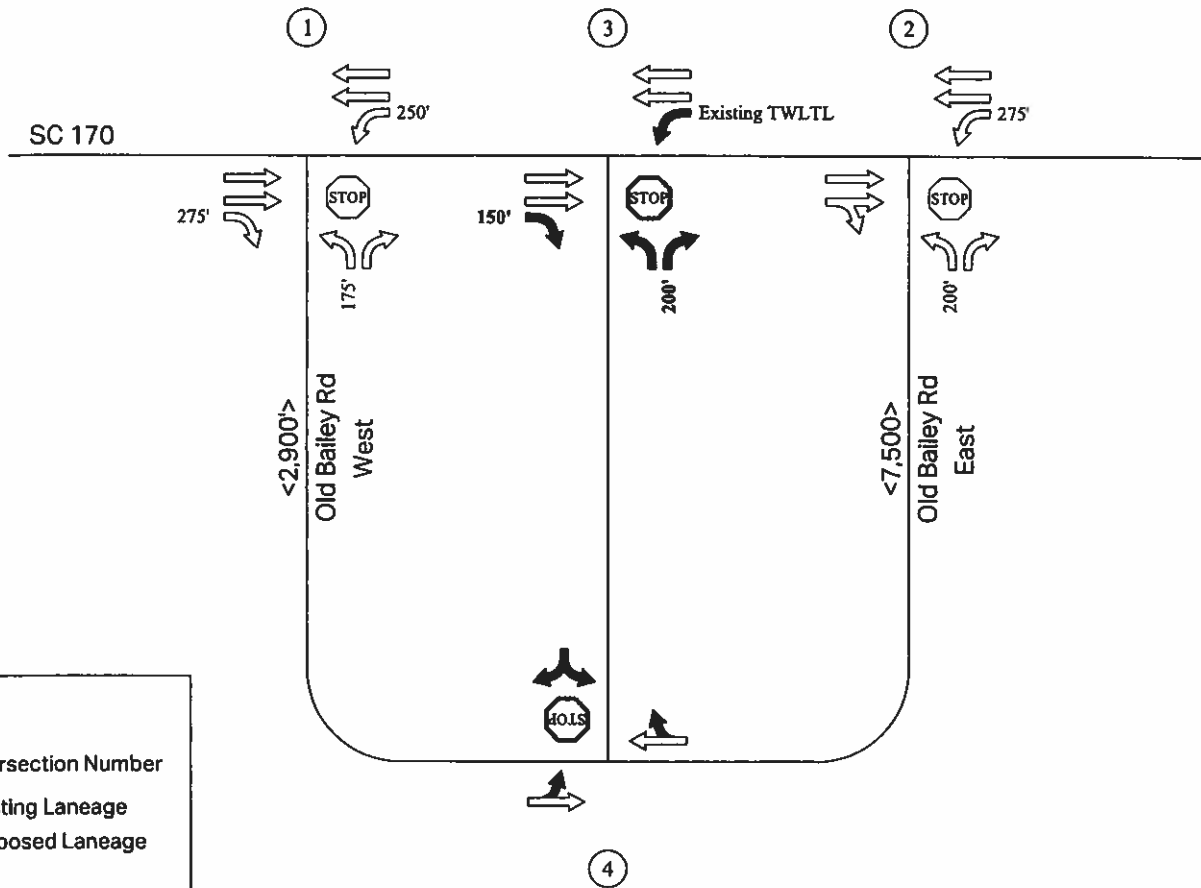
shows the proposed Build 2027 proposed laneage and Figure 12 shows the Build 2027 AM and PM peak hour volumes and LOS. As indicated in the tables, the northbound approaches at intersections #1 (Old Bailey Road West) and #3 (Site Driveway #1) with SC 170 are expected experience significant delay and queuing. It should be noted that the volume to capacity ratio is less than 1.0 at the Old Bailey Road West intersection and not likely to warrant a traffic signal.
